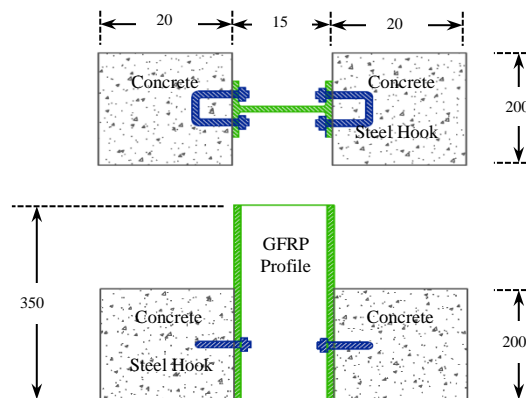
Geometry of the test specimen (mm): plan (top) and section (bottom)
